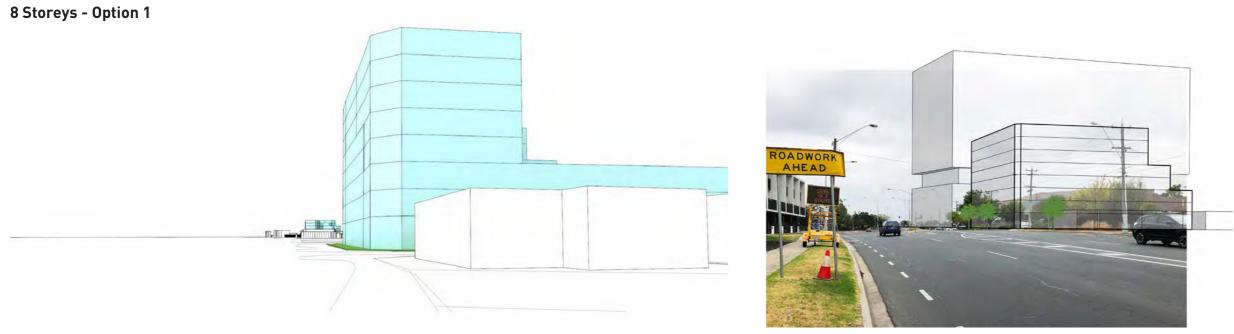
8 storey street wall height along the full length of Heidelberg Road viewed from south side of street (left) and from across the street further to the west - looking east (right)
